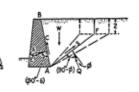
Retaining Wall. Active Earth Pressure in Clay.
